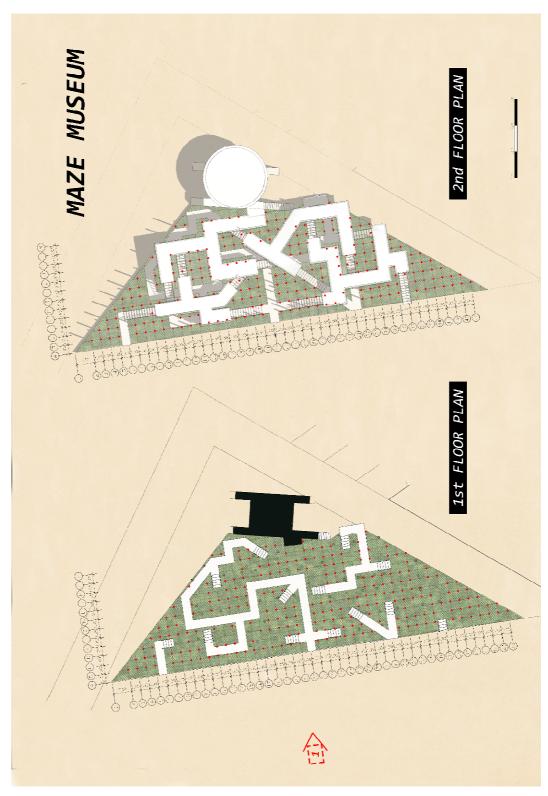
Maze Museum Floor Plan (source : *author's illustration*)
